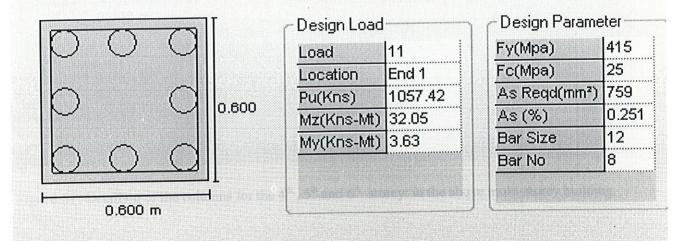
Detailing of the columns for the 1st, 2nd and 3rd storey in the above multi-storey building
